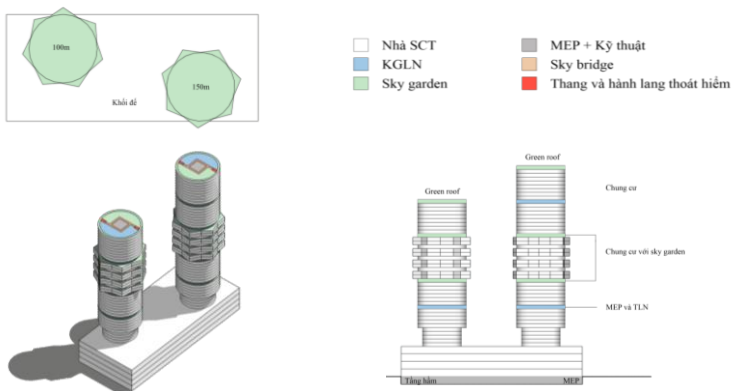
Indoor green shadow space with tower and double super-storey house
